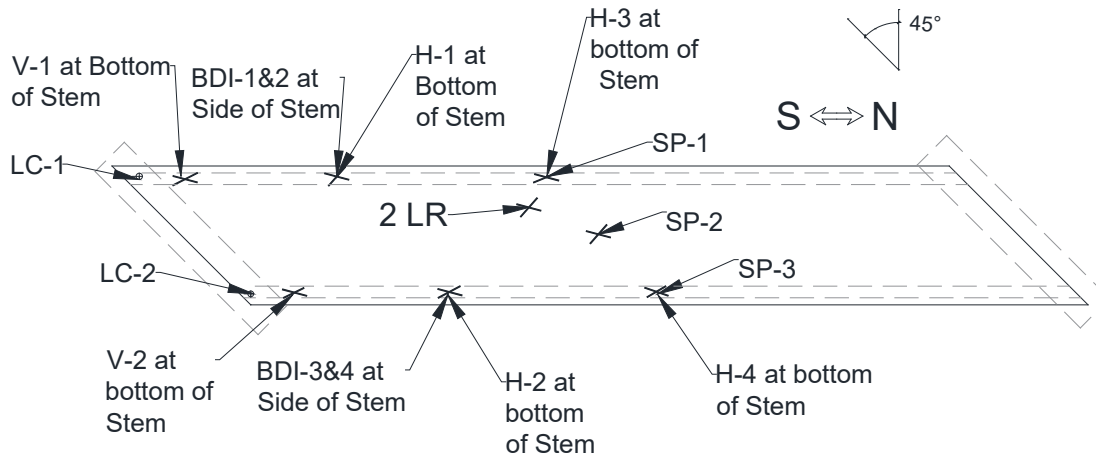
Installation of BDI Sensors on 30-ft (9.14-m) Long Girder
